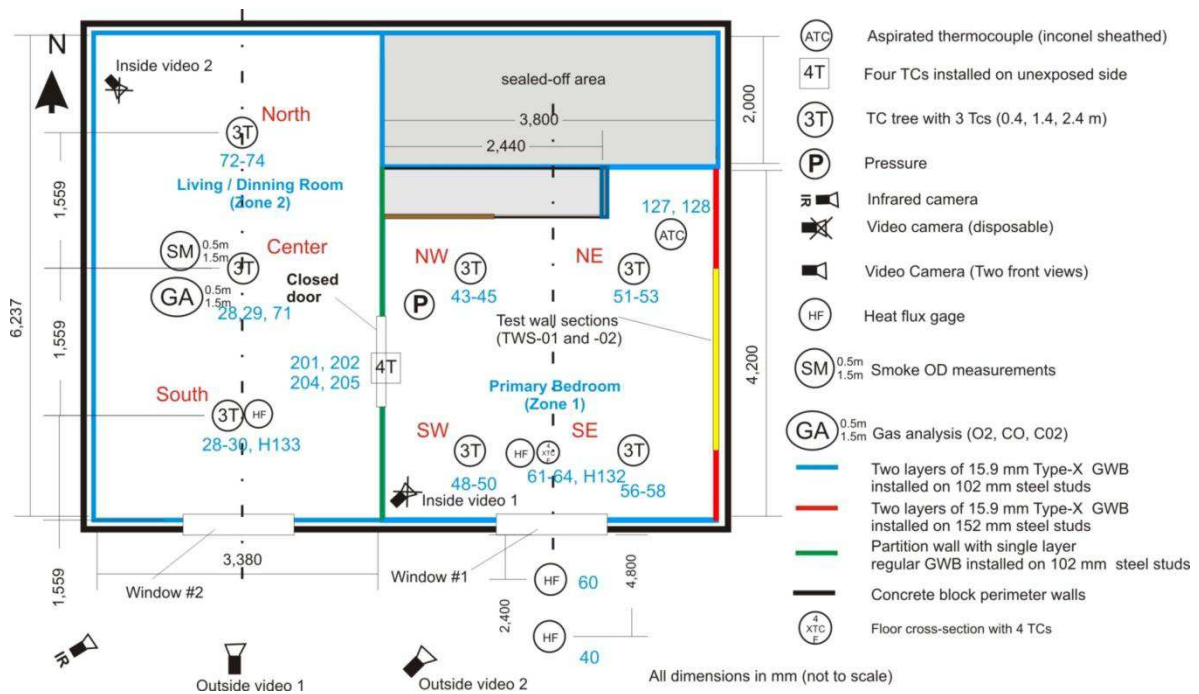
Test PRF-08 - Instrumentation floor plan showing location of TC trees.
